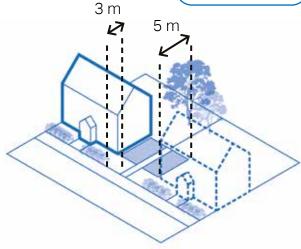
Illustrative diagram showing an indicative layout of on-plot side parking
